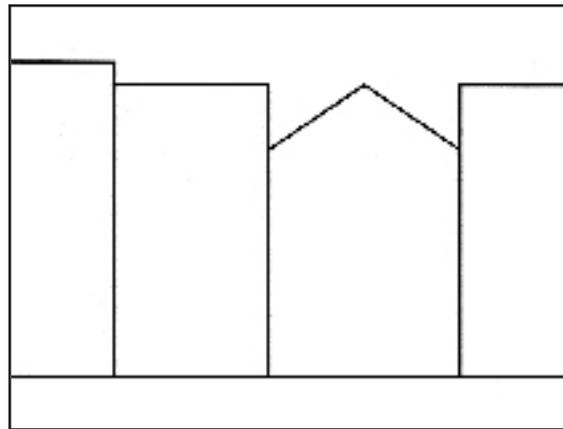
If the area of influence of a proposed project site, especially with adjacent buildings, has flat or sloped roofs hidden with parapet wall it is inappropriate to introduce a new roof form, such as a gabled roof.
